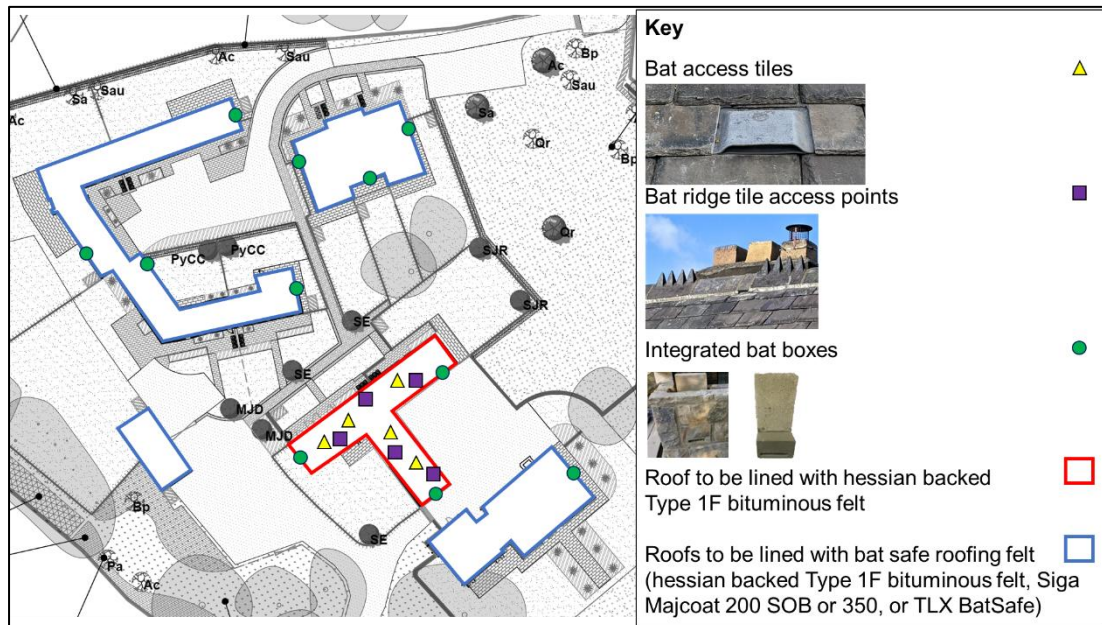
Bat roost plan, with red outlines indicating roost buildings
